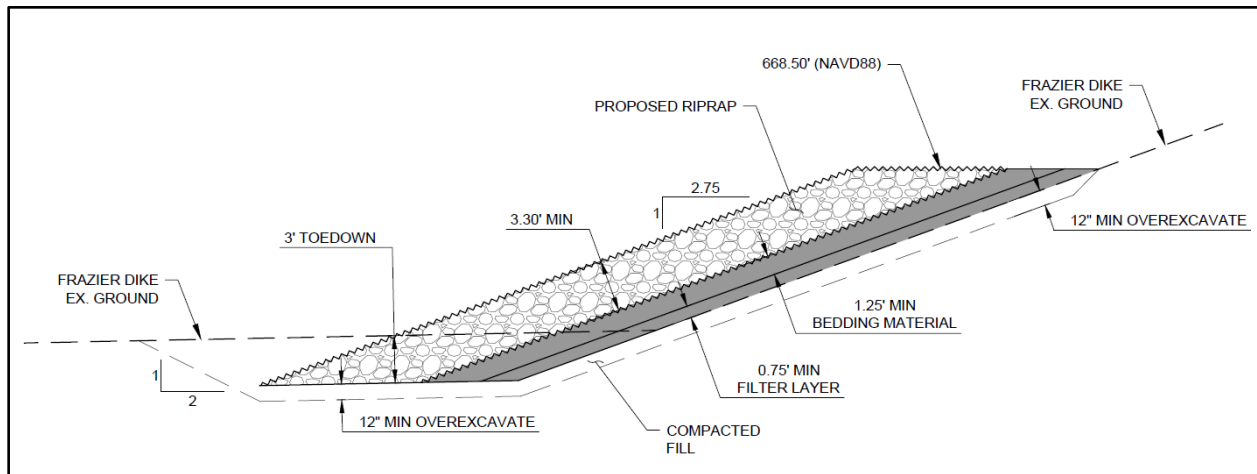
The current gross pool reaches the toe of the dike. Typical cross section of rock revetment (riprap) placement along Frazier Dike. The rock revetment would extend 13.5 feet above the current gross pool elevation and 3.5 feet above the proposed, higher gross pool elevation.
